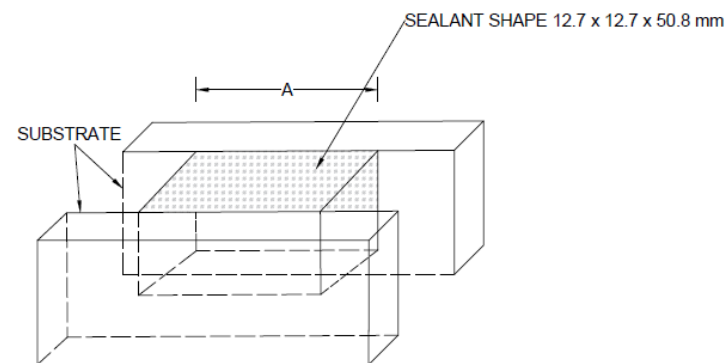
END VIEW OF TEST SPECIMEN WITH SPACER REMOVED
